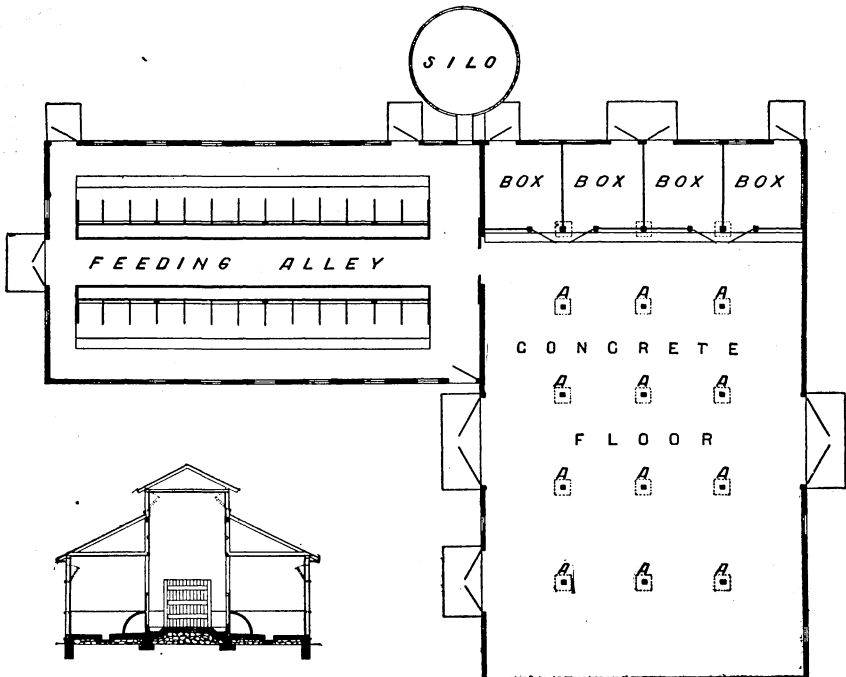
Floor plan and cross section of stable for 26 cows, box stalls, silo, and space for wagons and farm machinery.
